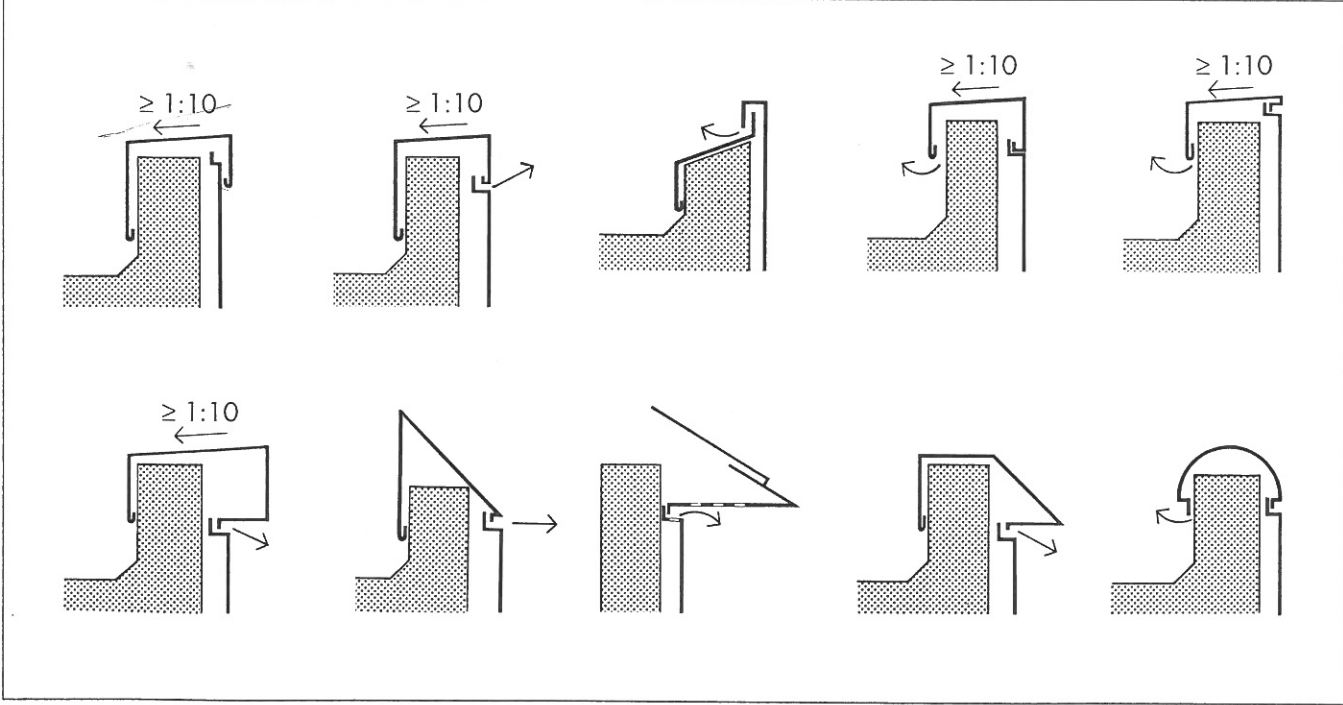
Examples of eaves junctures, schematic drawing. The wall's ventilation opening is marked with an arrow. The horizontal part of the eave's sheet metalwork should generally be inclined towards the roof so that sooty water does not flow onto the surfaces of the panels, especially from metal sheet surfaces that do not have drip beaks
